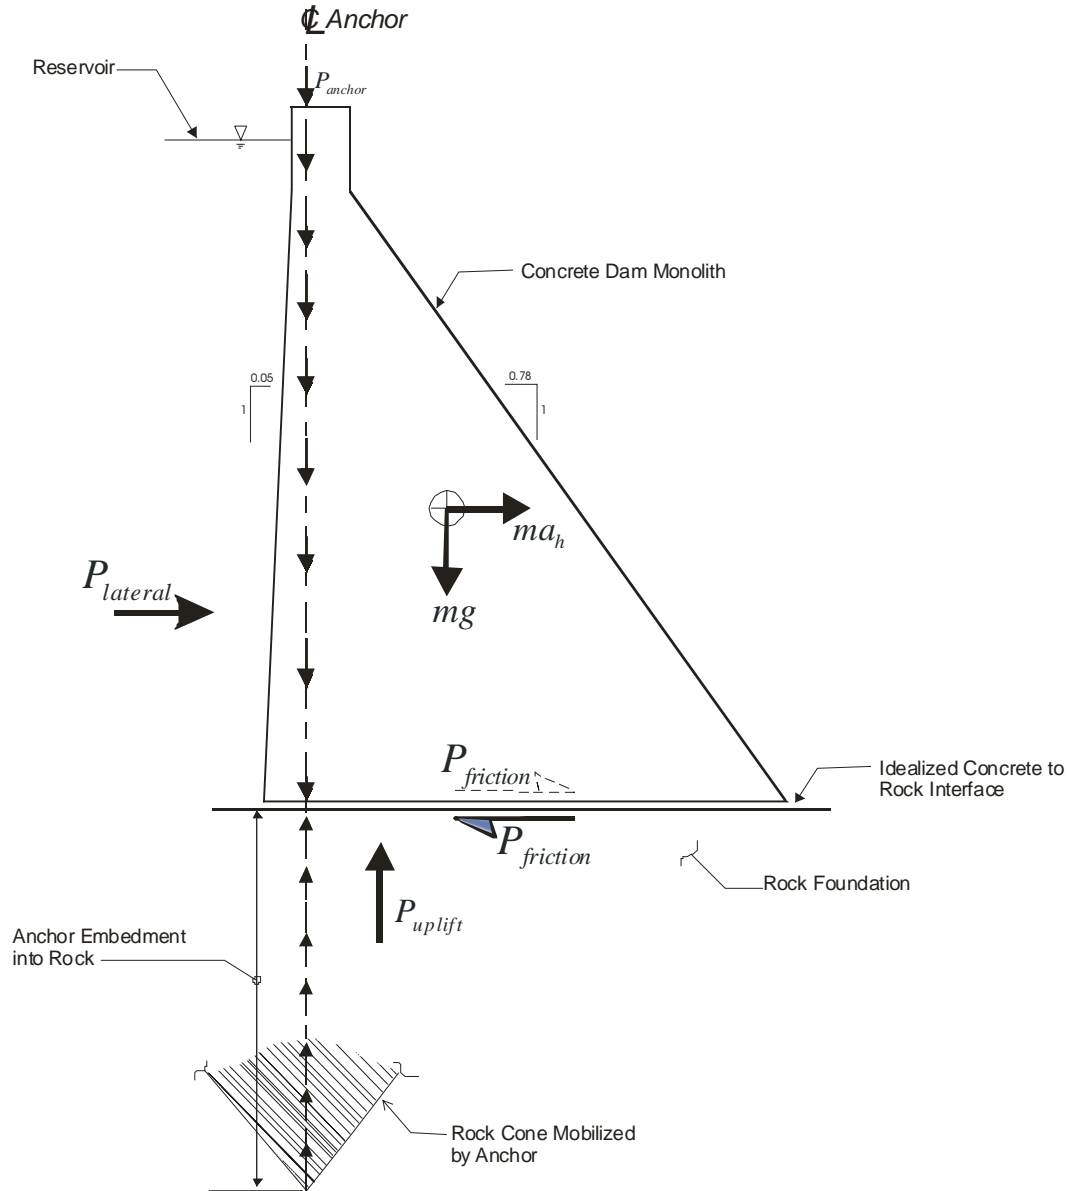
Primary Forces Acting on The Pine Flat Dam Monolith with Anchor.
